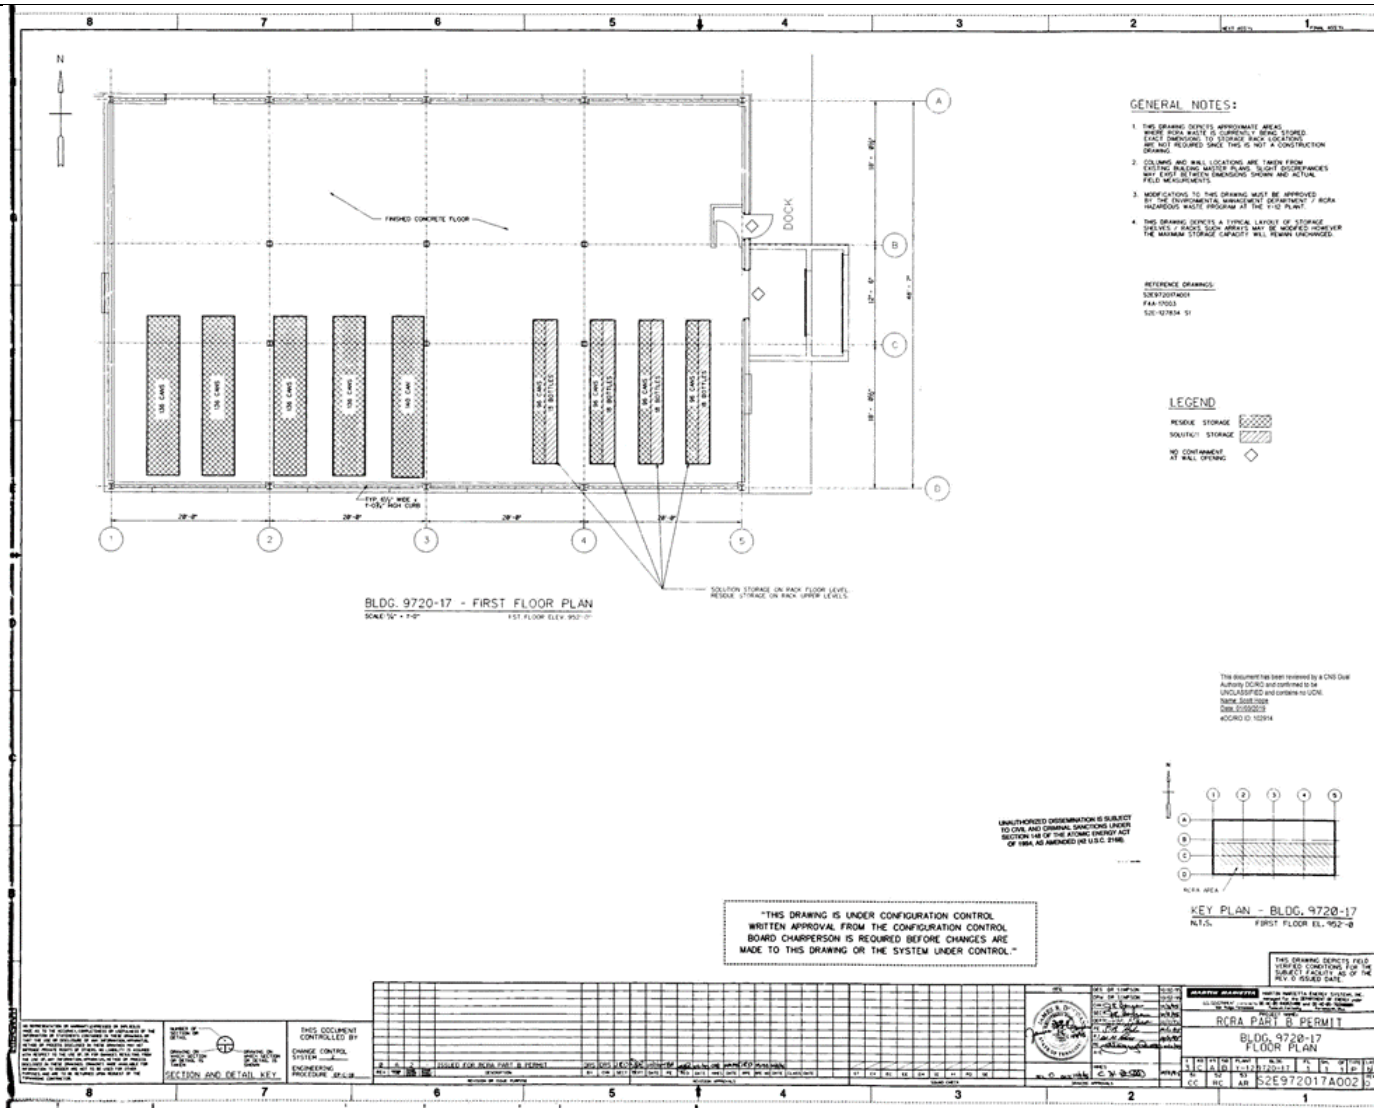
Drawing Dated 1995 Shows use of Building 9720-17 for RCRA Storage
